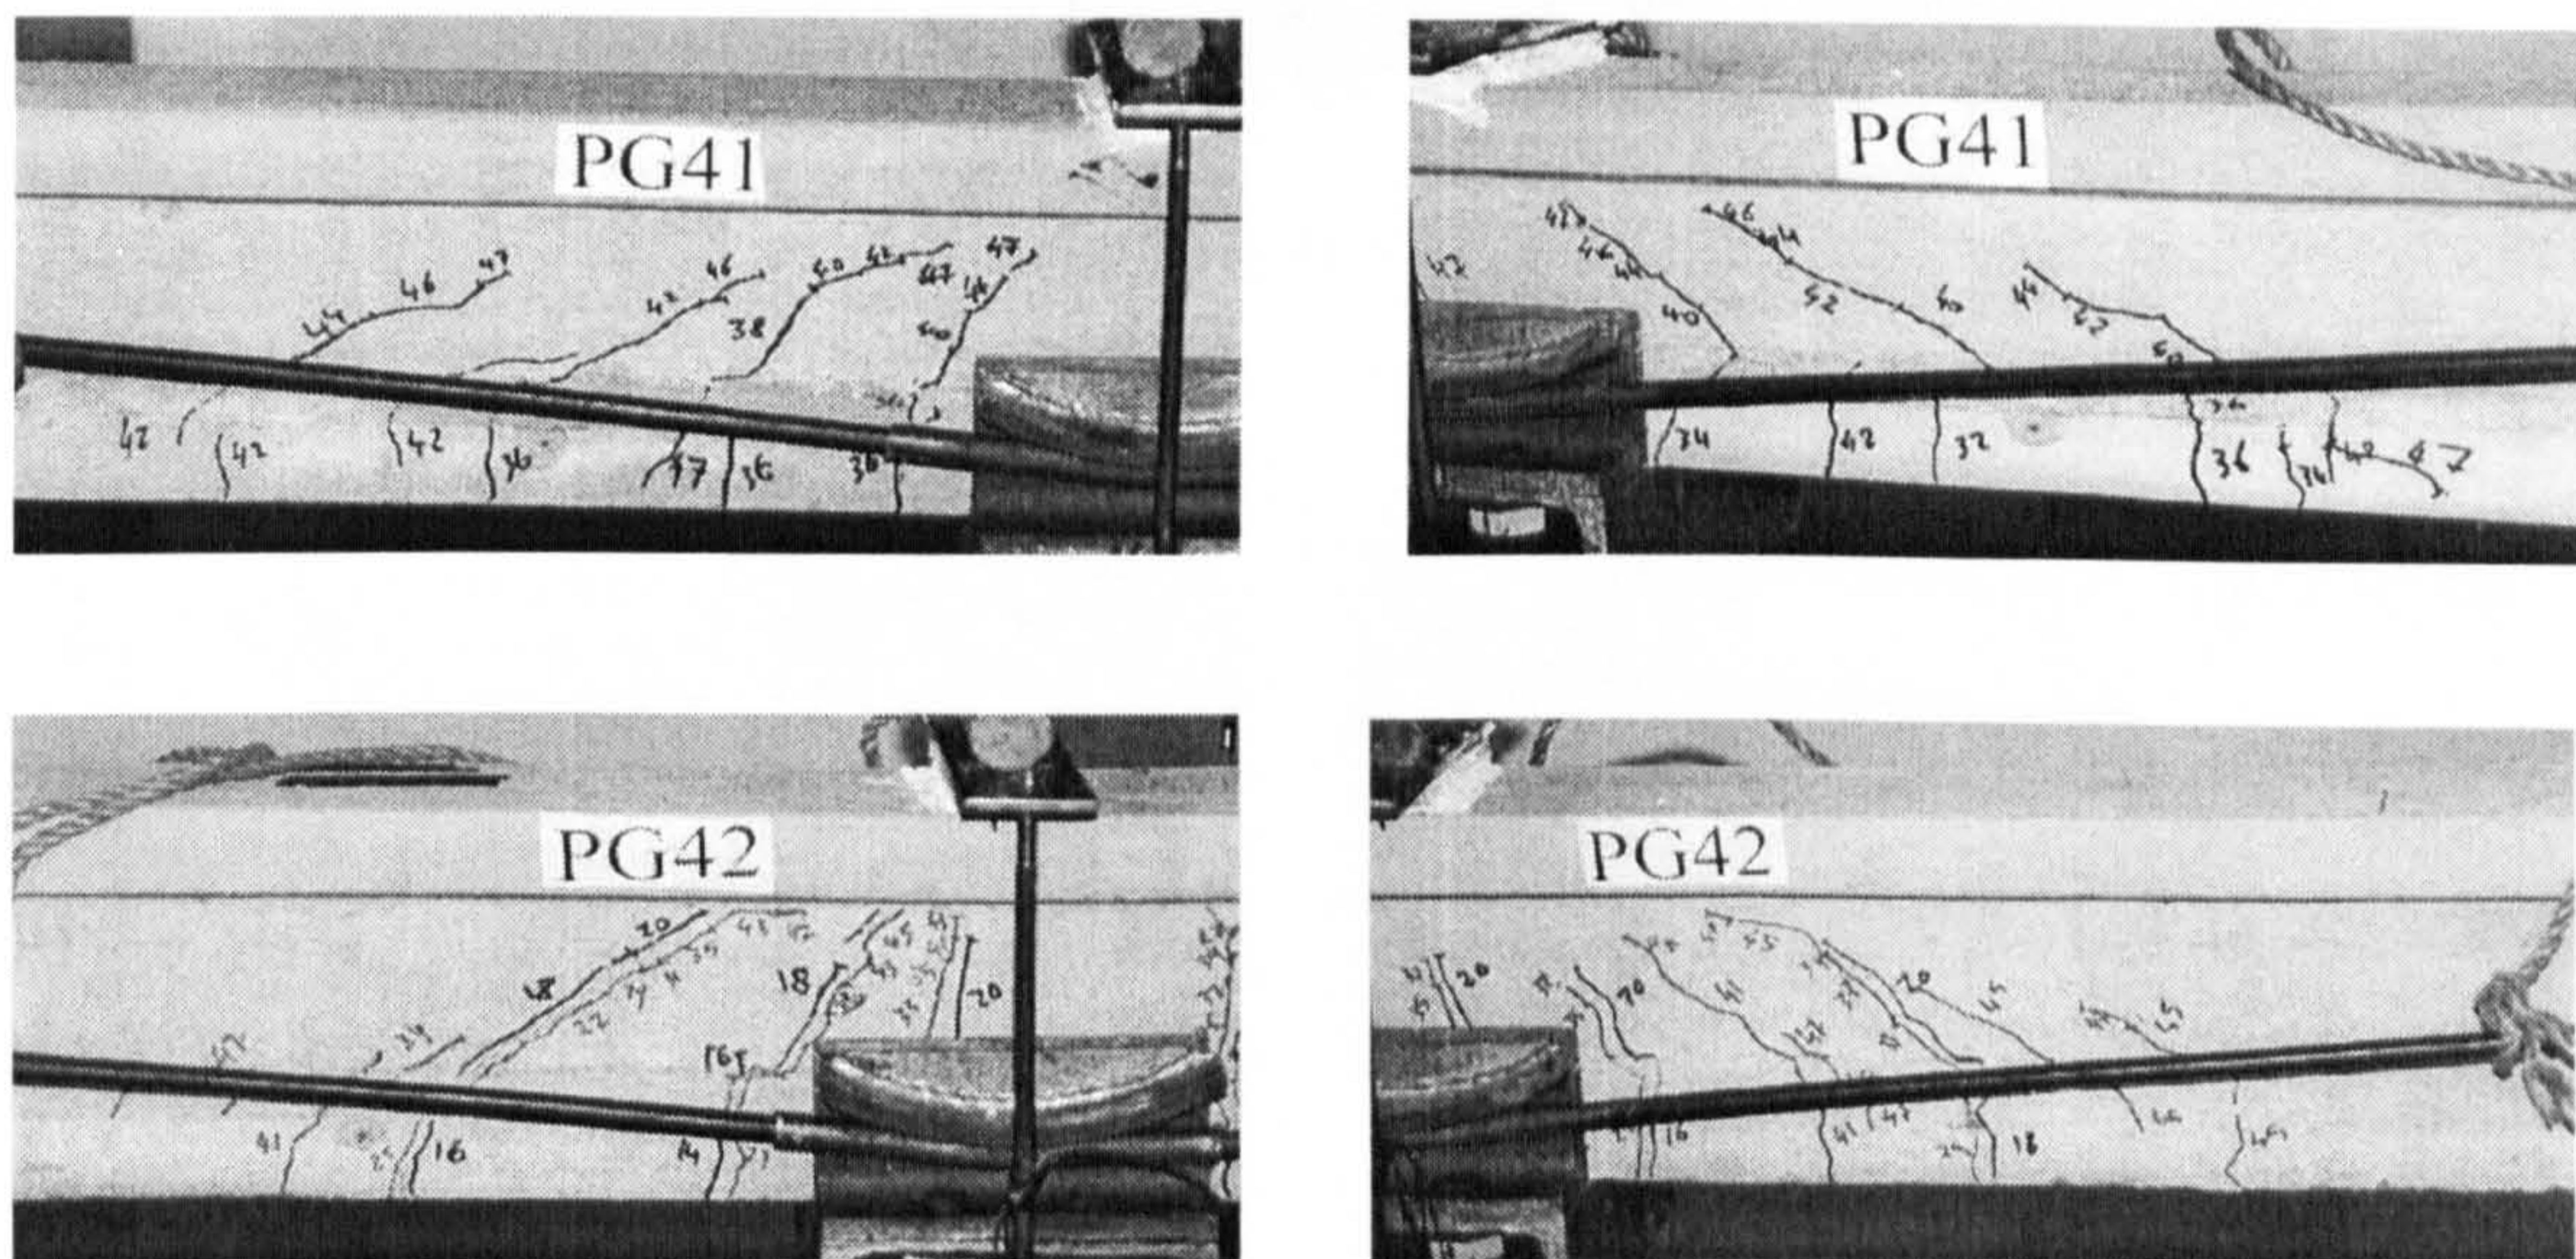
Shear cracks pattern of beams PG41 & PG42 after external prestressing
